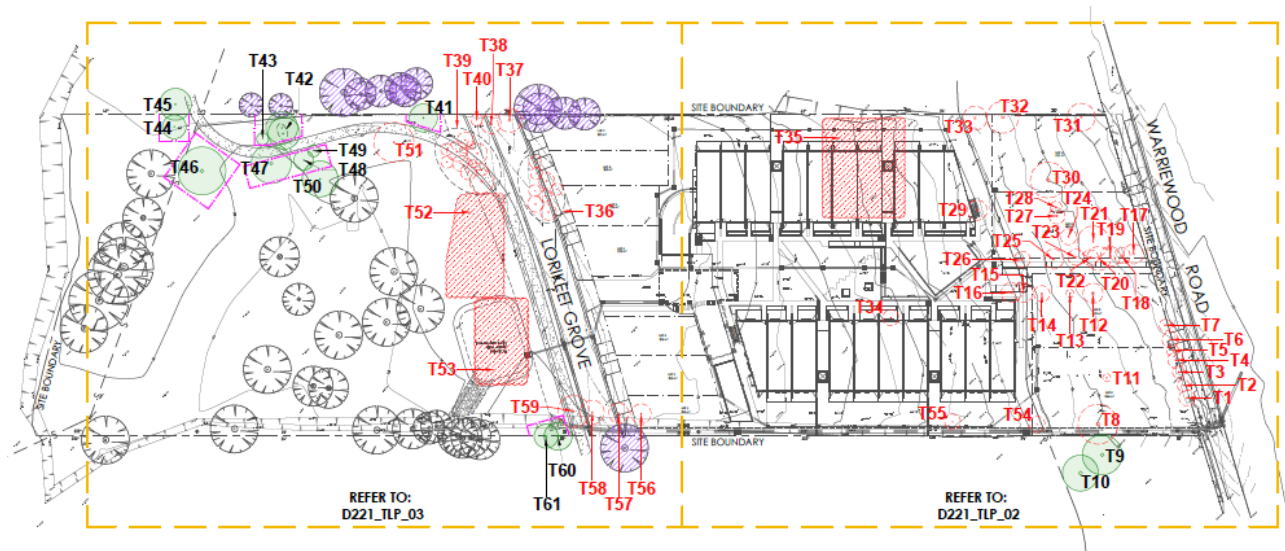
Tree Location Plan extract: refer to Appendix 2 for full Tree Location Plan
